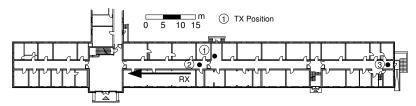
Floorplan of building where indoor shadowing measurements were taken
